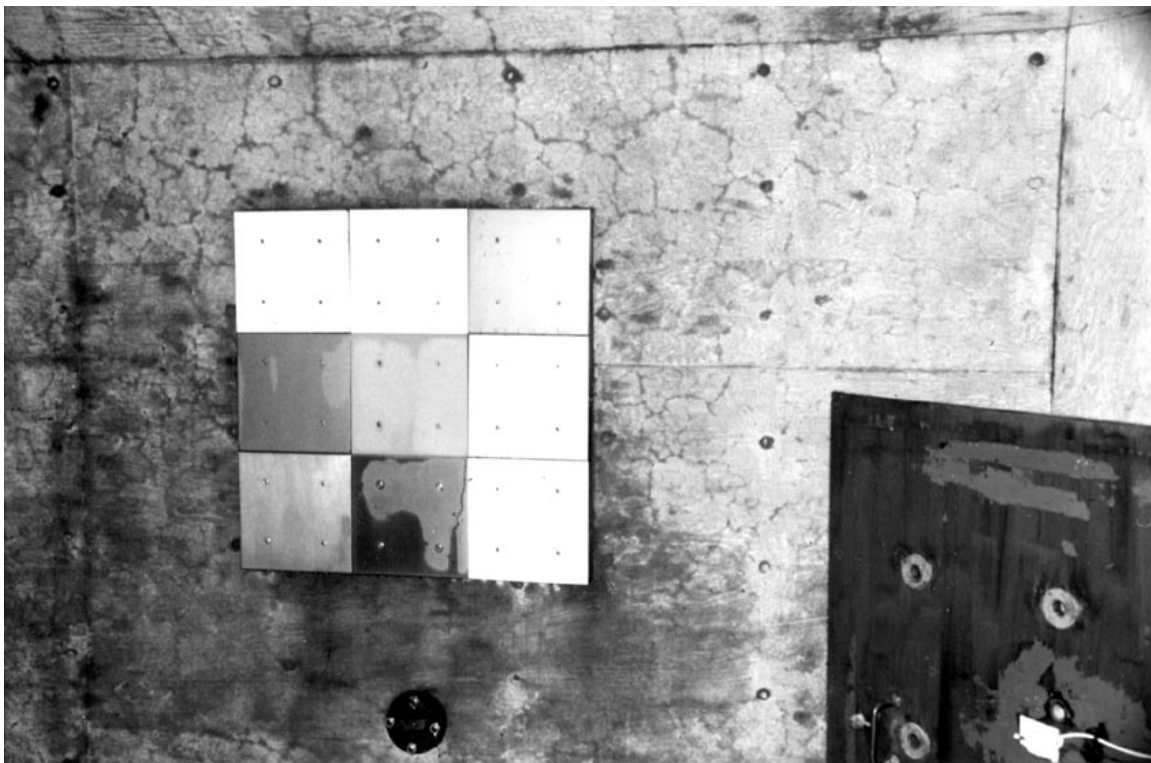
Interior cracks in north wall after 100% charge level experiments.
